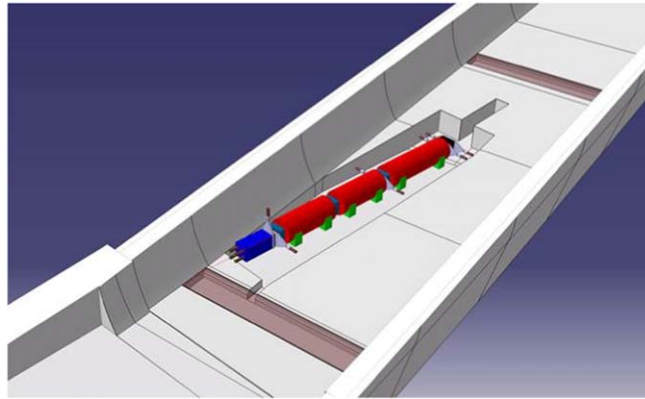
View of FASER in tunnel TI12. The trench lowers the floor by 45 cm at the front of FASER to allow FASER to be centered on the beam collision axis. Credit: CERN Site Management and Buildings Department.
